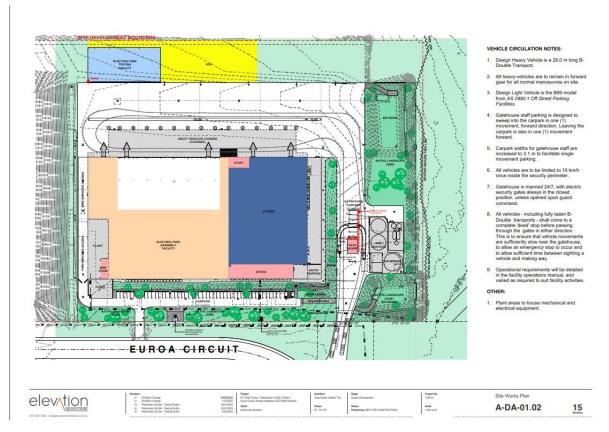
Building Layout excluding Gladstone Testing Factory
